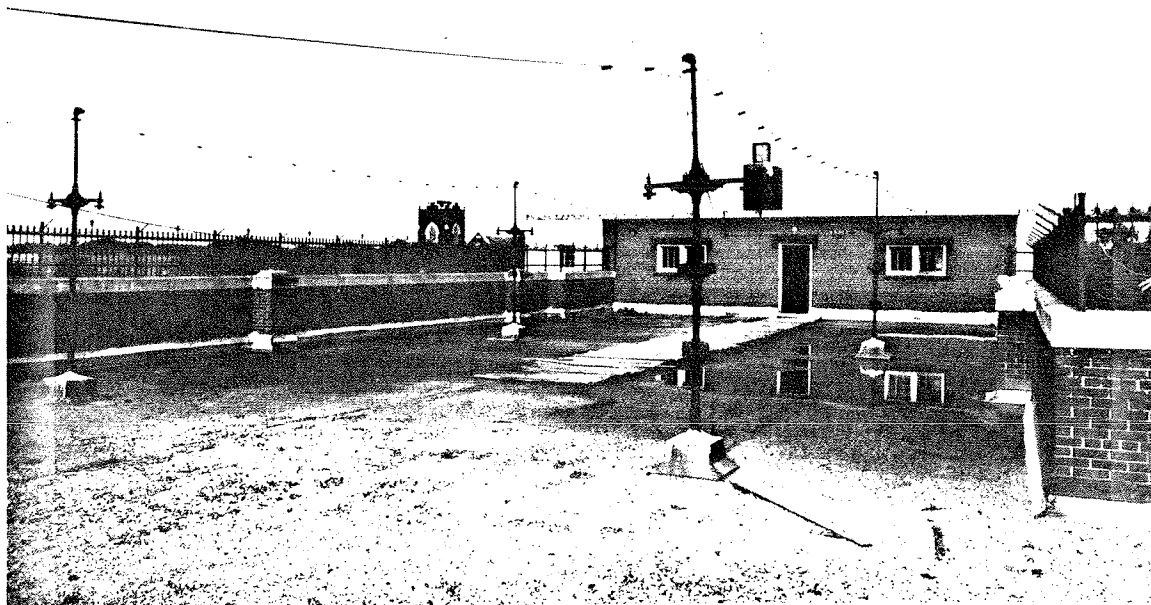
Gainsborough Apartments, 508 Sherbrook Street
